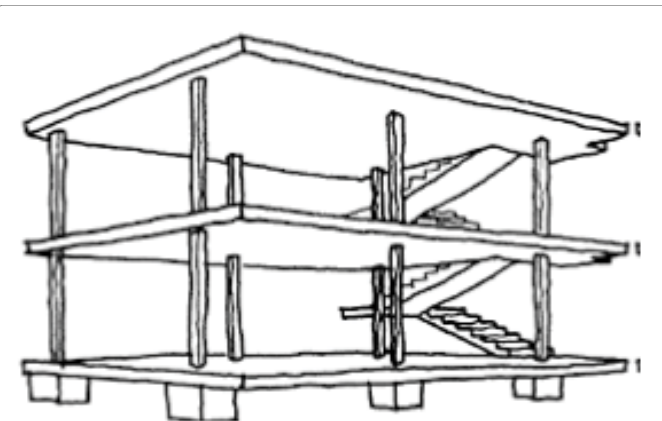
Domo's house, 1915, replacement of the column from wall to interior space.
